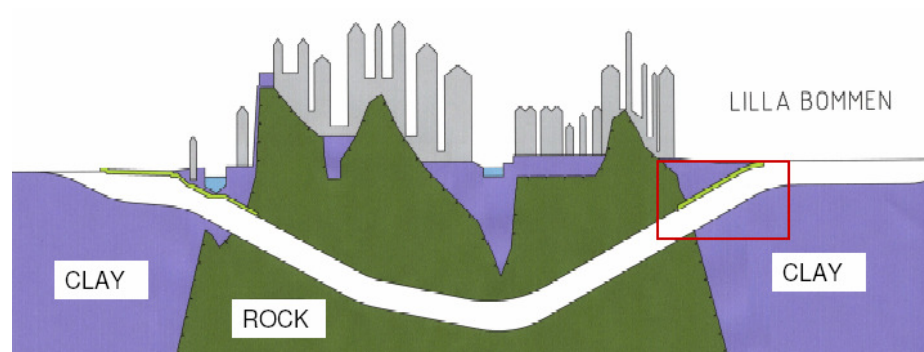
Longitudinal view of the Göta Tunnel. [27]
